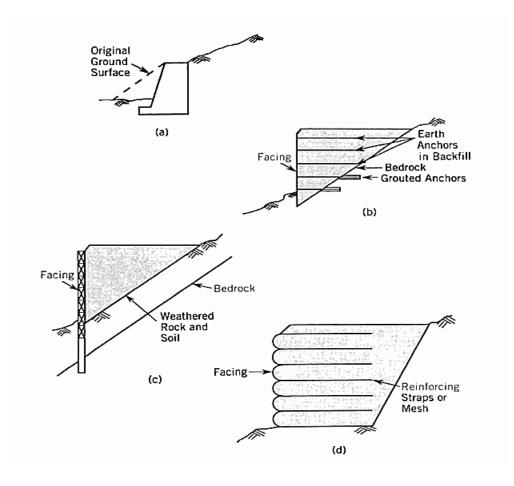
Types of retaining structures. (a) Gravity retaining wall. (b) Tieback retaining wall. (c) Sheet pile cantilever wall or soldier pile. (d) Mechanically stablised embankment [25].
